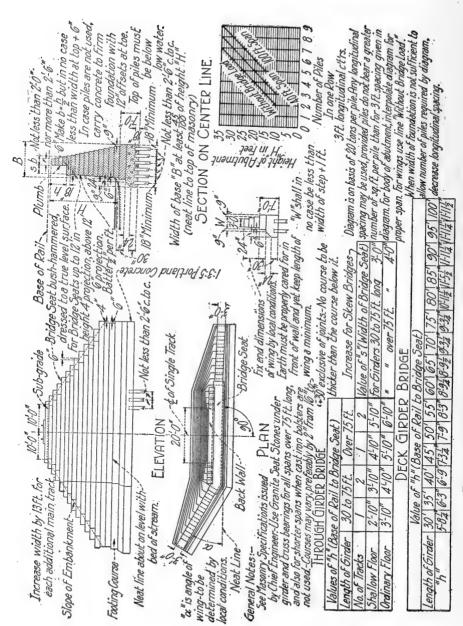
Masonry Abutments, Baltimore and Ohio Railway.
